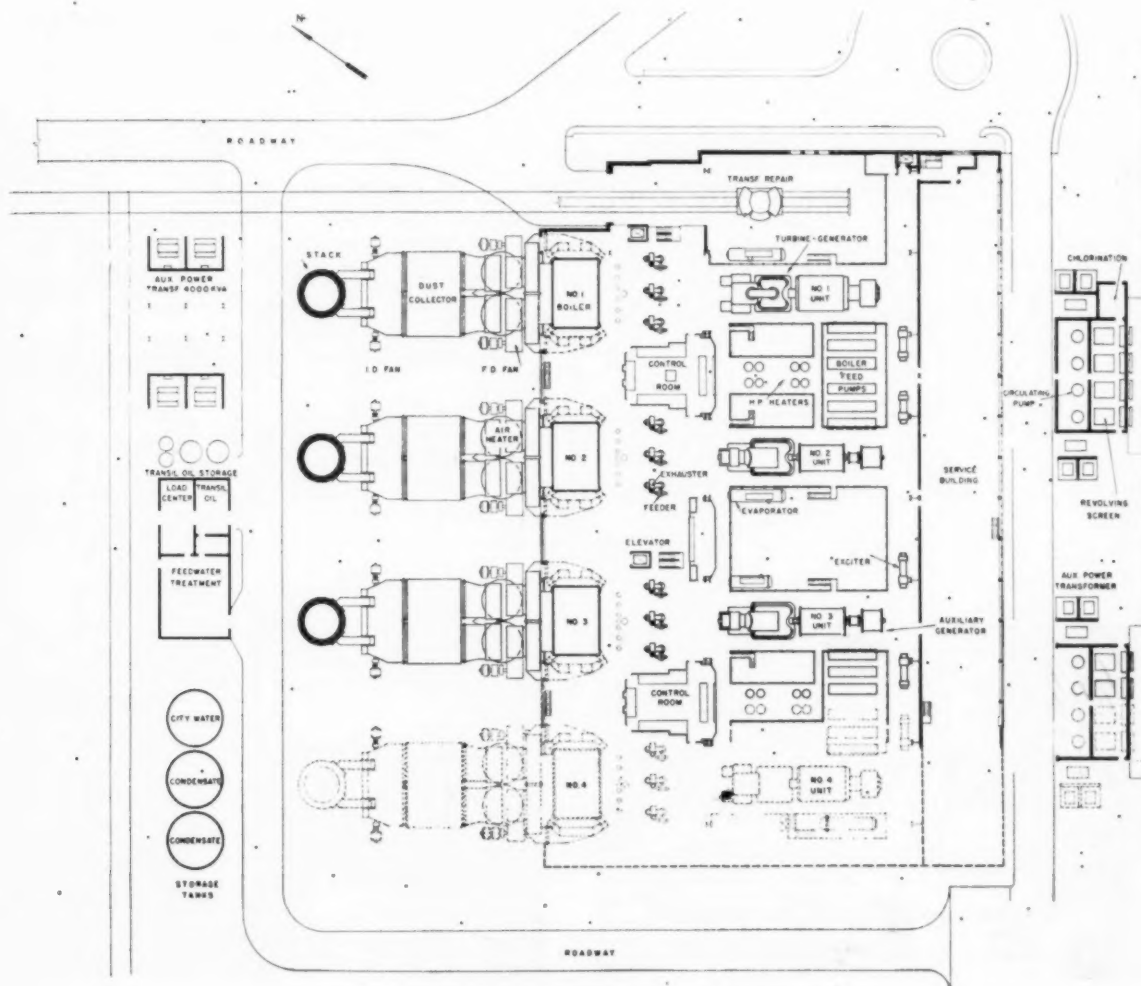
PLAN OF UPPER OPERATING FLOOR—SEWAREN
